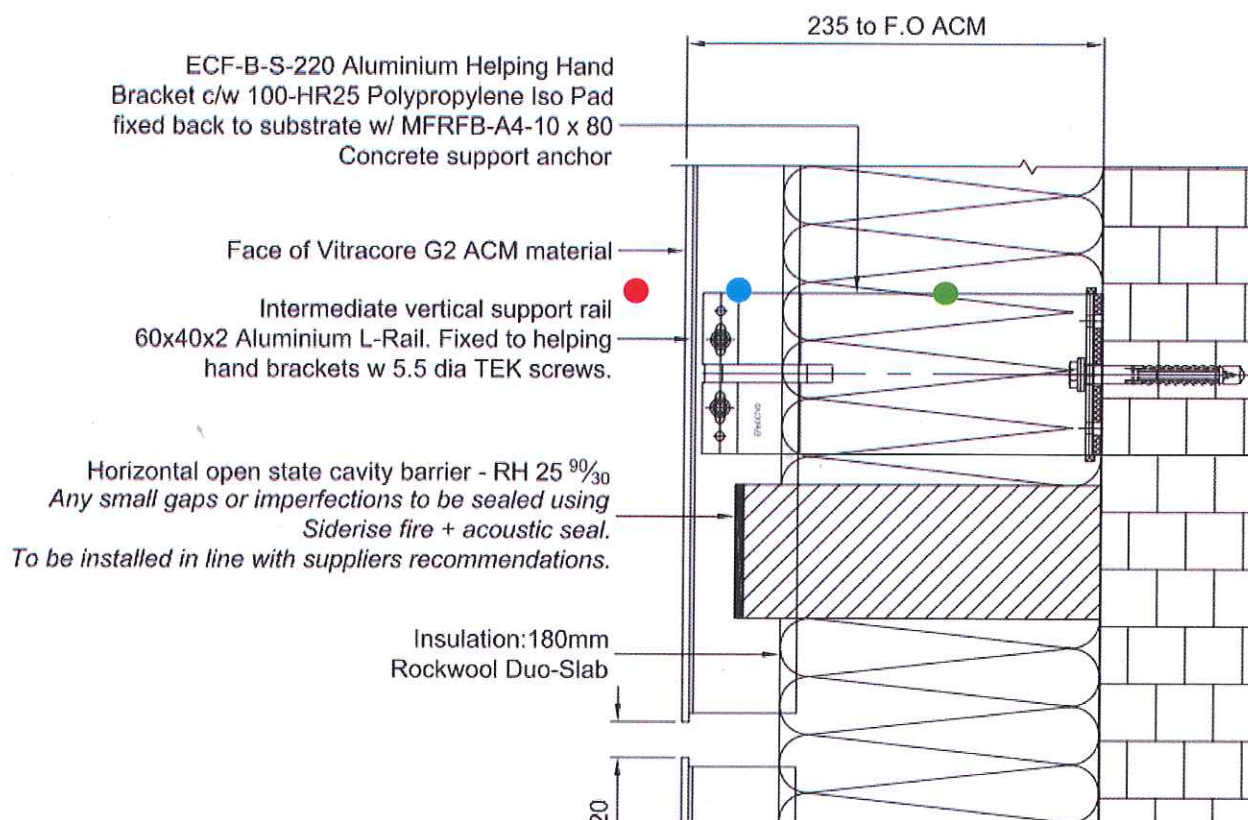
Level 2 Section Drawing Showing the Thermocouple Locations
